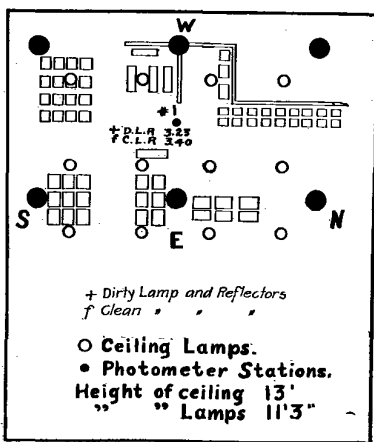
Section plan of fifth floor, (household furnishings), showing location of furniture, pillars, lighting units, test stations and illumination data.
